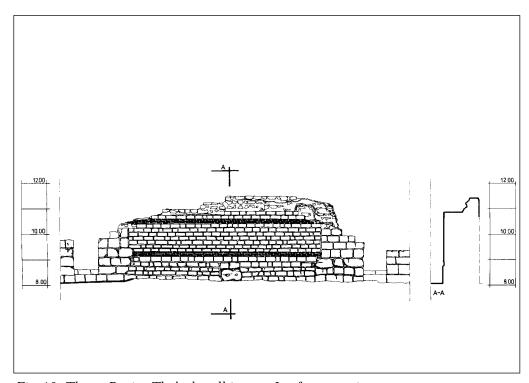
Theater Portico. The back wall in sector L, after restoration (Drawing A. Pisarzewski)
